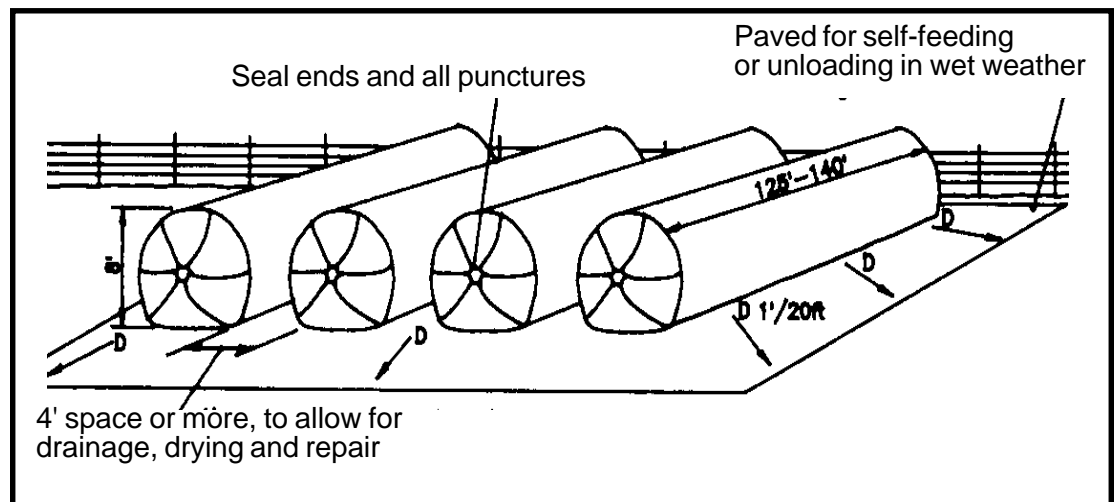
Horizontal silo. Source: *Beef Housing and Equipment Handbook, MWPS-6, Fourth Edition, 1987, Midwest Plan Service, Ames, Iowa.
